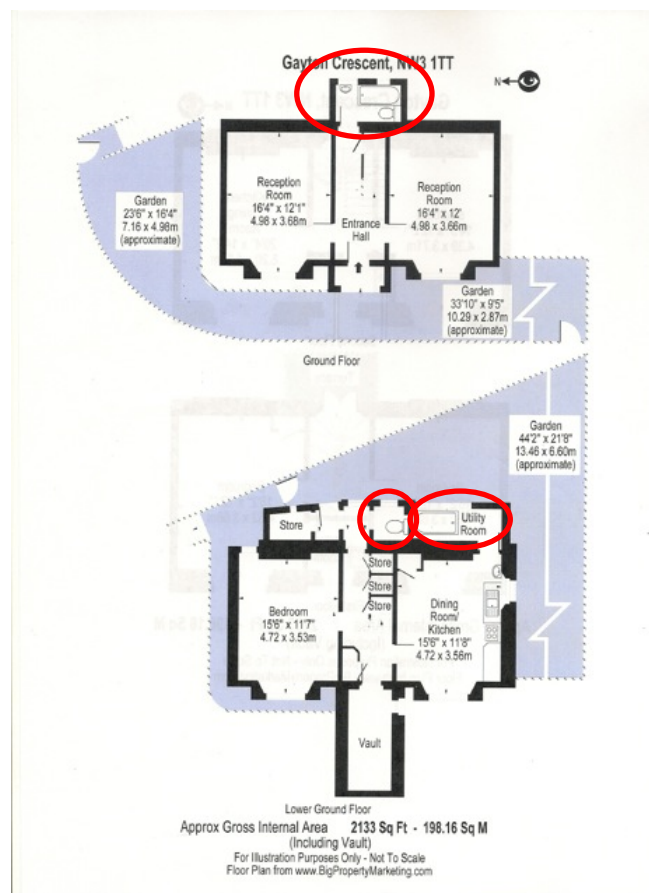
Floor plan for the property from 2007, showing separate bathroom and toilet on the Lower Ground floor at the rear, and a full bathroom with toilet on the ground floor at the rear.
